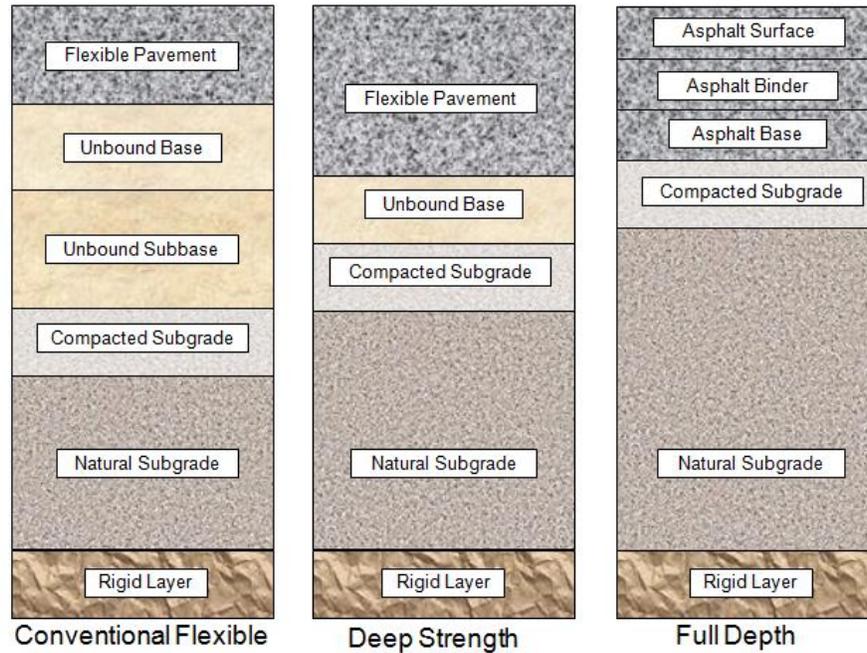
Asphalt Concrete Pavement Layer Systems
